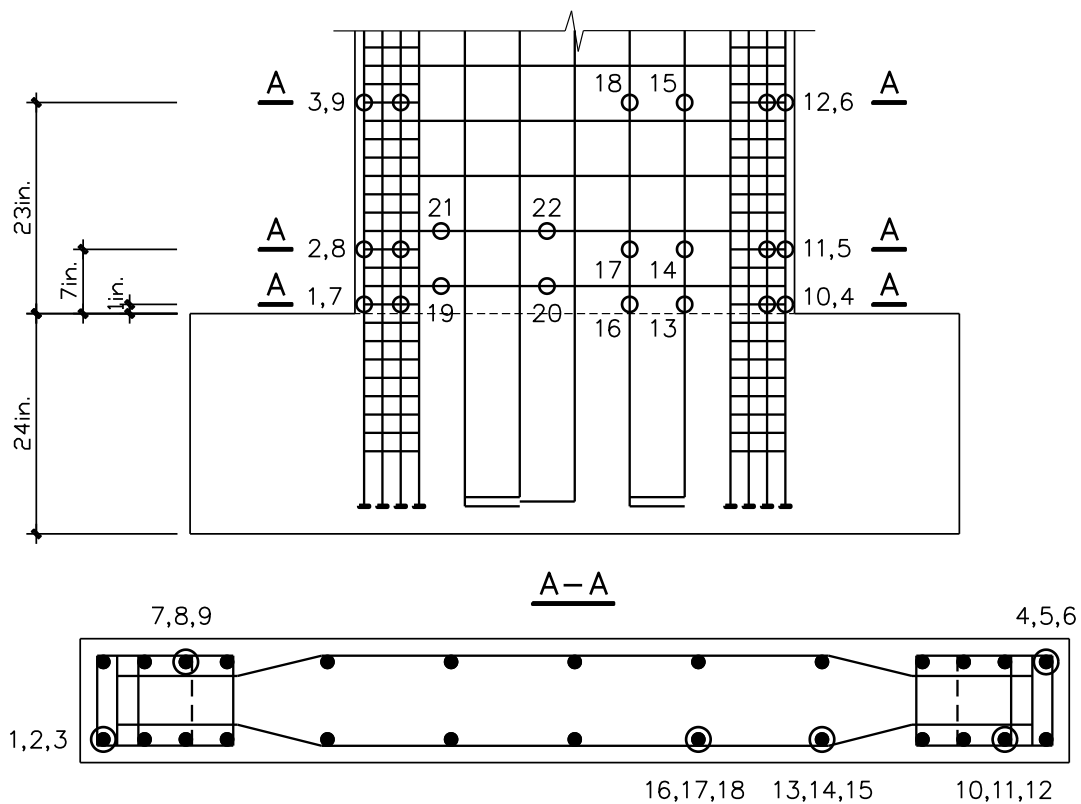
Strain gauge layout on boundary longitudinal reinforcement, web vertical and horizontal reinforcement
